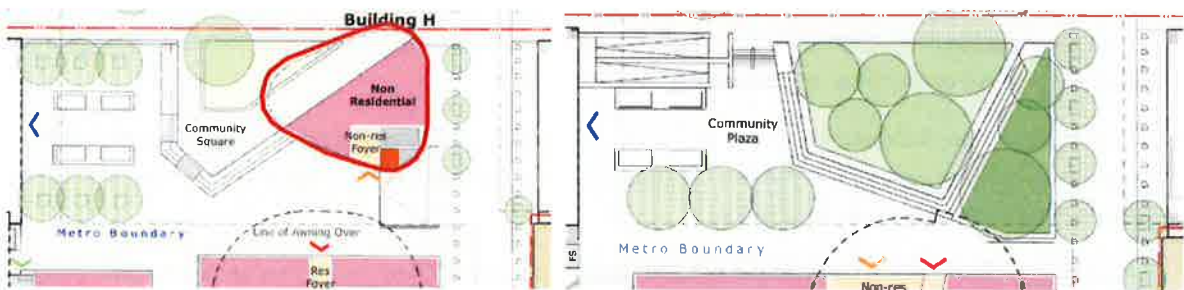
| Left: Exhibited Cope Street Plaza at ESI stage containing Building H, with total building footprint in red outline. Right: Figure 28 | Cope Street Plaza layout at RtS stage with Building H removed
